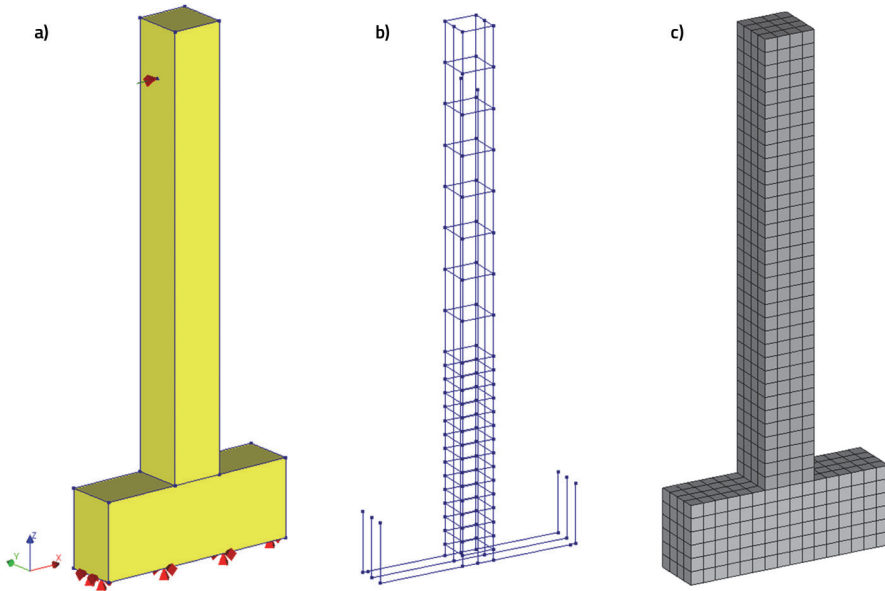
a) Geometry of the beam, b) reinforcement truss elements, c) FE mesh with CHX60 $h = 5$ cm
